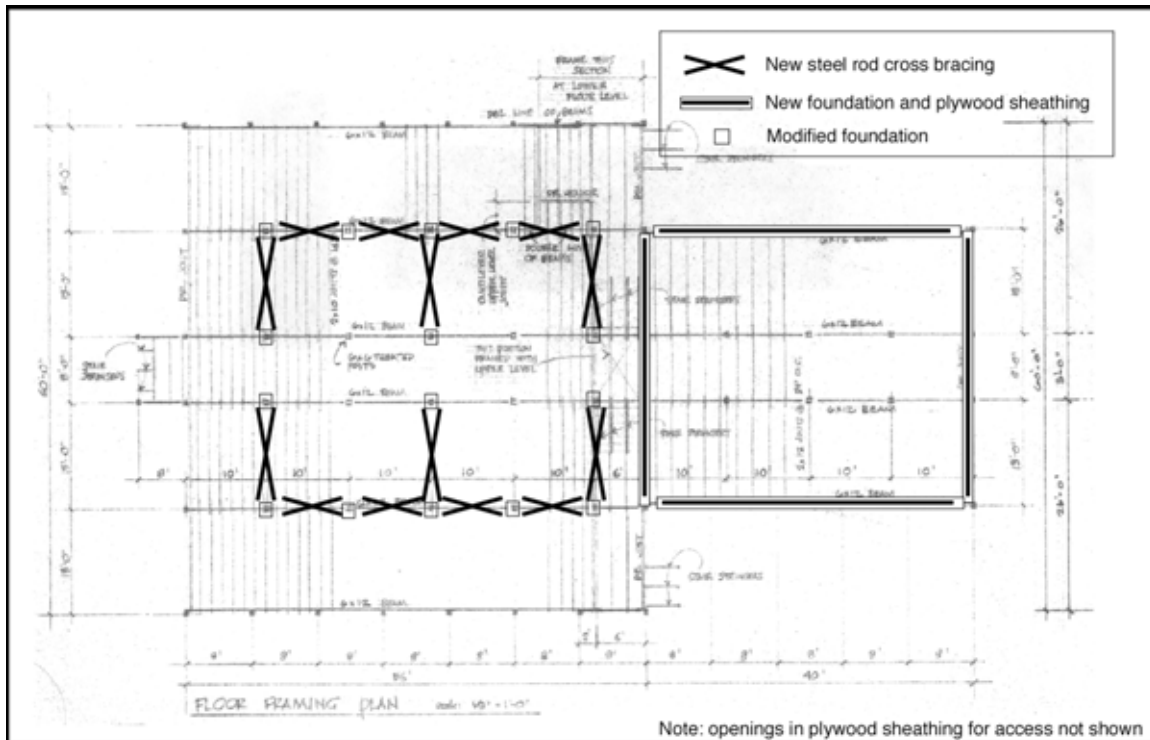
Seismic Upgrade, Central Portion, Ouzinkie
